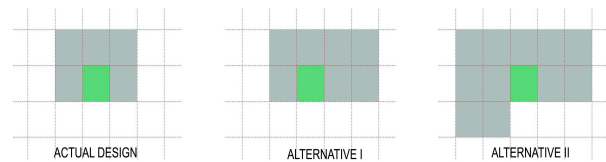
Modular and flexible spatial planning of houses alternatives.
